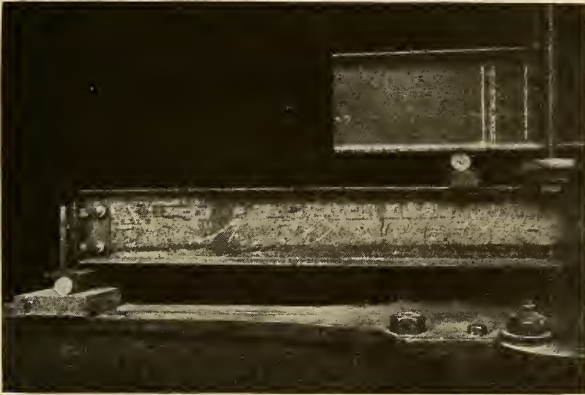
APPARATUS FOR TESTING I-BEAM WITH RESTRAINT AGAINST END TWISTING.
